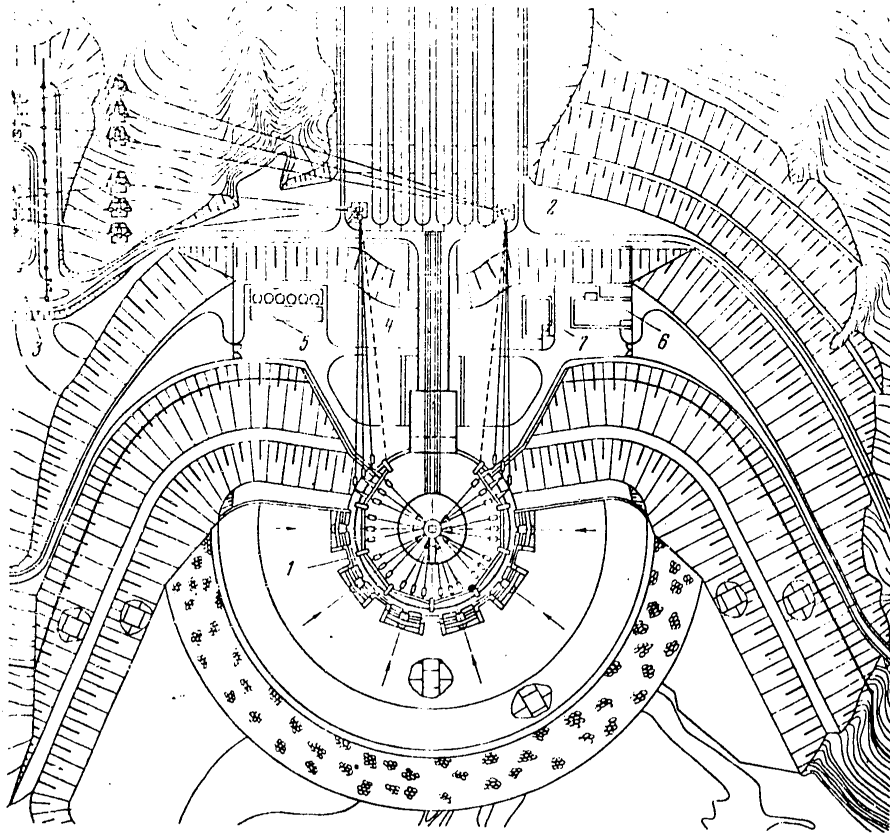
Plan of Plant Center: 1--GAES structure; 2--conduits; 3--ORU platform; 4--ferroconcrete trestle; 5--central oil plant; 6--servicing production building; 7--dining room
